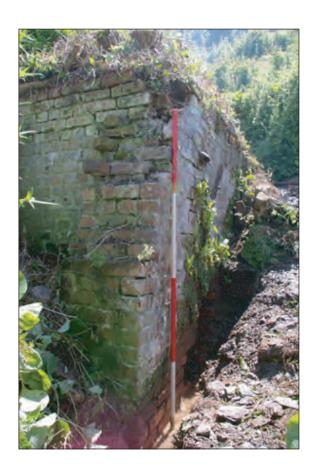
The west wall of the water tank during demolition, viewed from the north.
